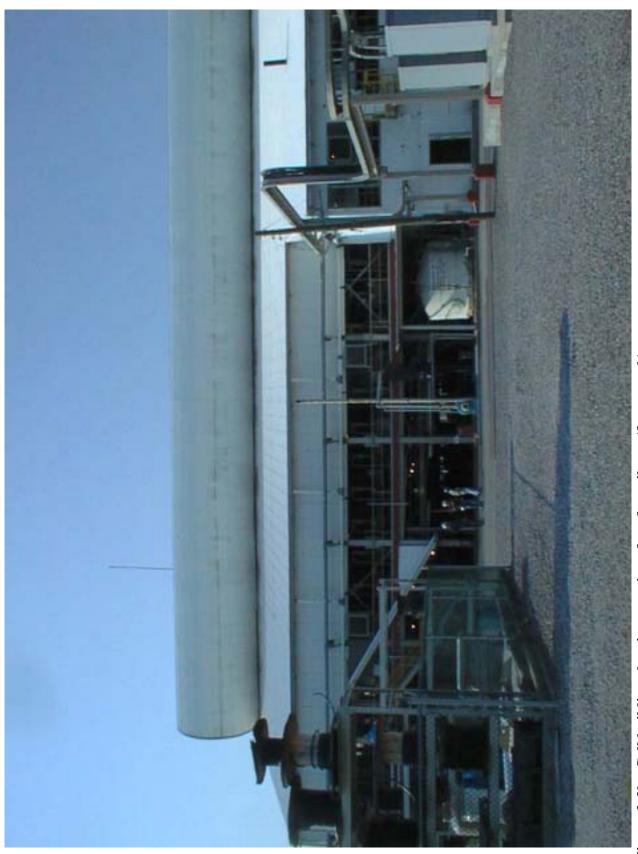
Cell building showing exterior of roof ventilator (from north).
